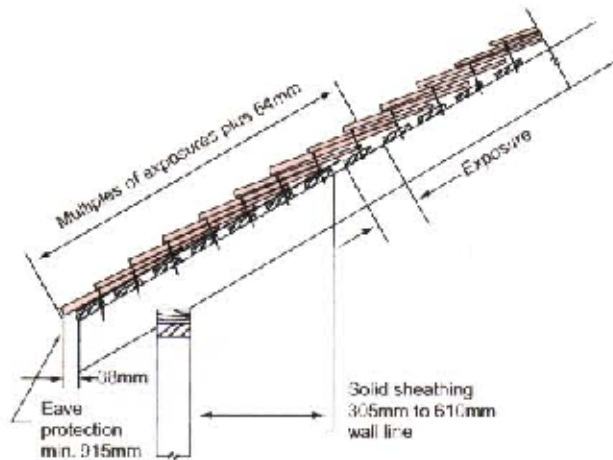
Shingles Applied Over 25 x 38mm Minimum
